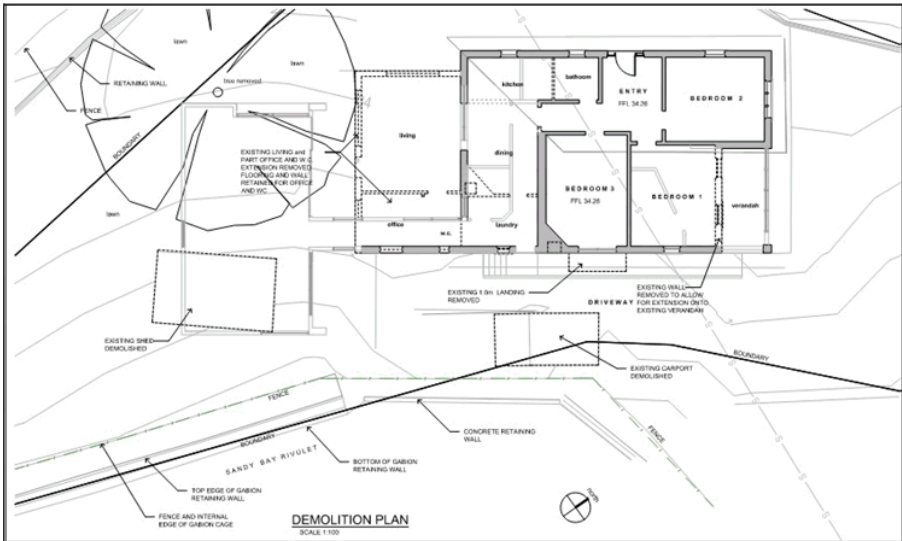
Existing floor plan and proposed demolition (Eade Designs, 2020)
